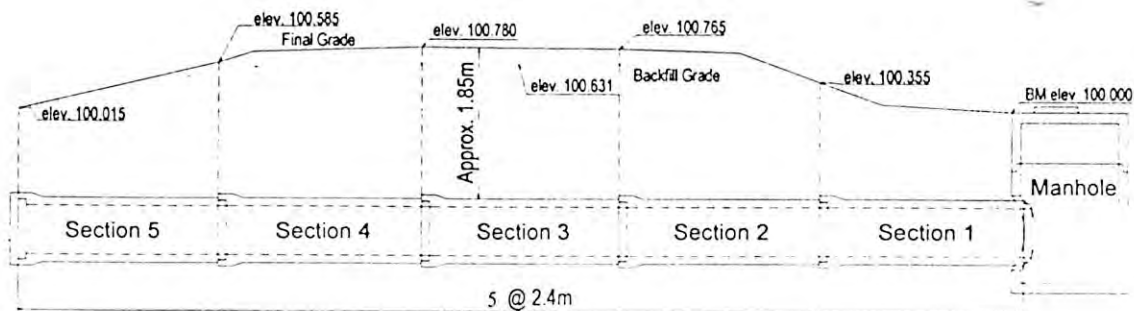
Longitudinal Profile of the Approaching Ramp along with Test Pipes (Wong, 2002)
